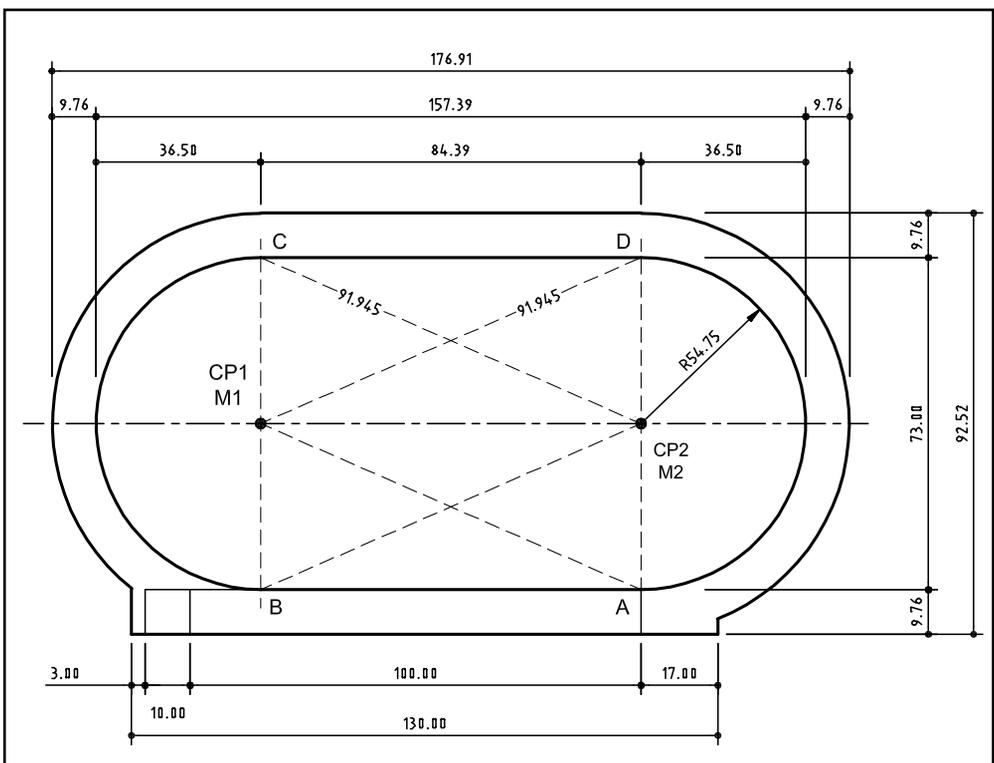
Setting out plan and dimensions of 400m Standard Track
